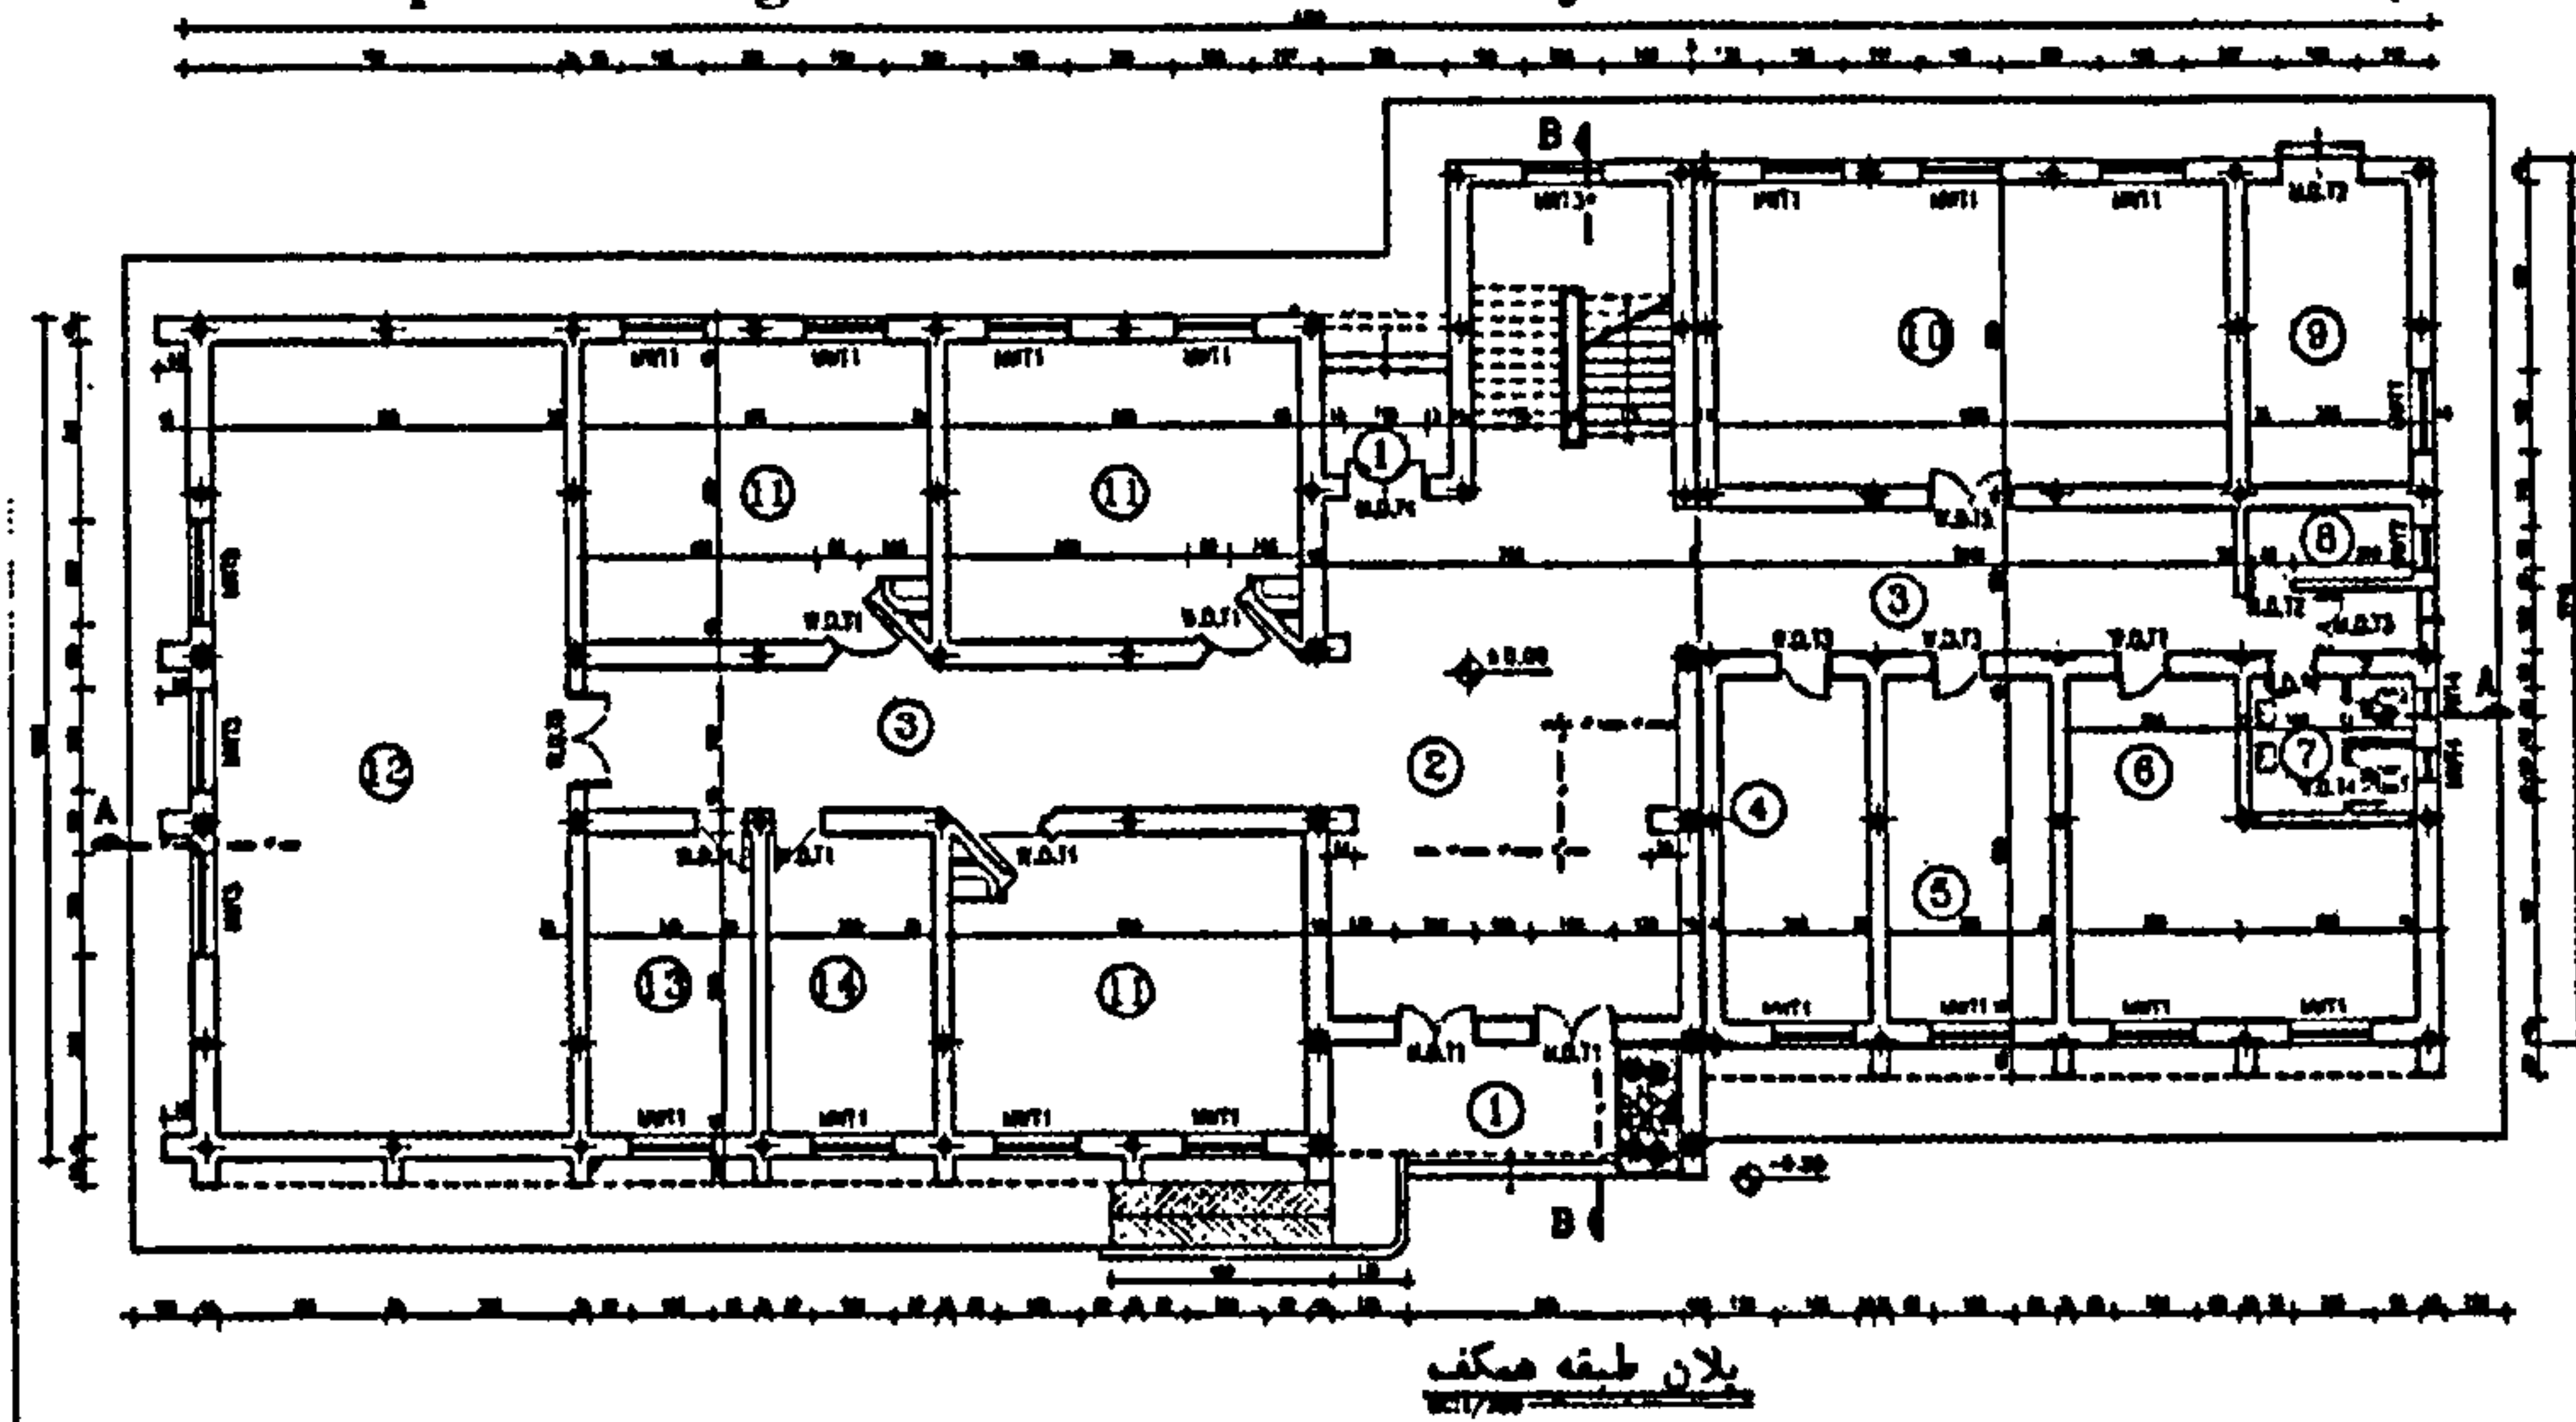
The plan of the first floor of a secondary school with 9 classrooms (Number 5)
